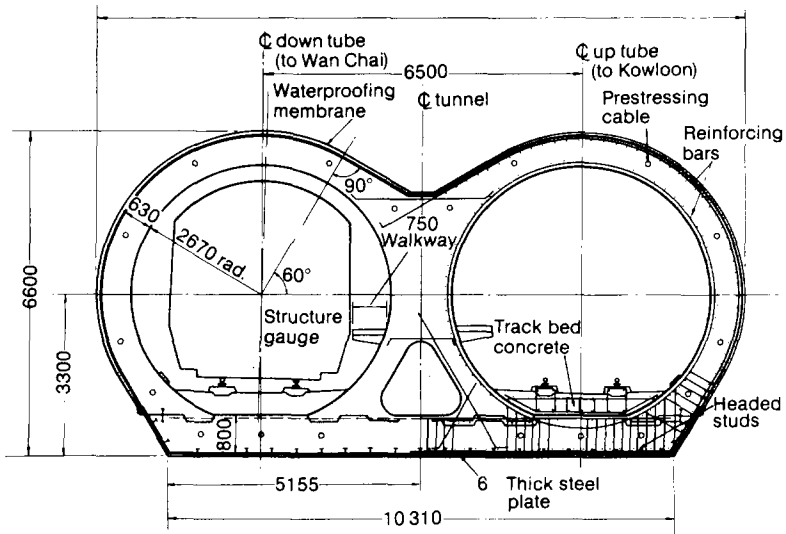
Immersed tube tunnel: typical unit cross-section (dimensions in millimetres)
